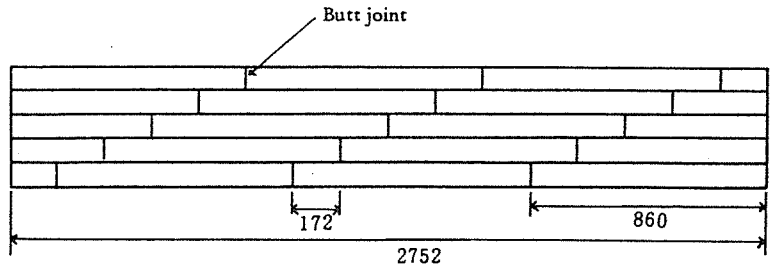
Veneer construction of LVL specimen. (unit mm)
